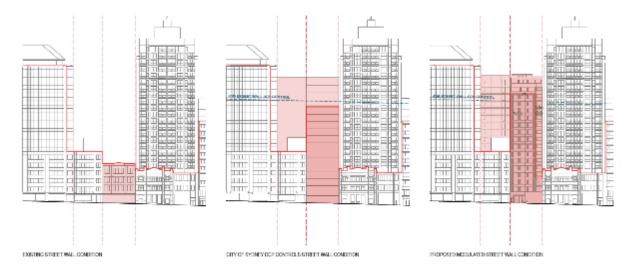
Street wall analysis of eastern side of Castlereagh Street, showing the existing site, the DCP compliant built form and the proposed development
